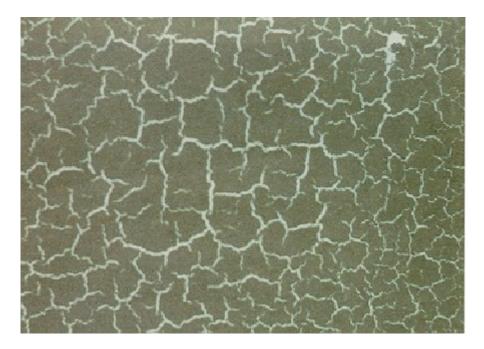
(c) Alligatoring (typical mud crack pattern)
